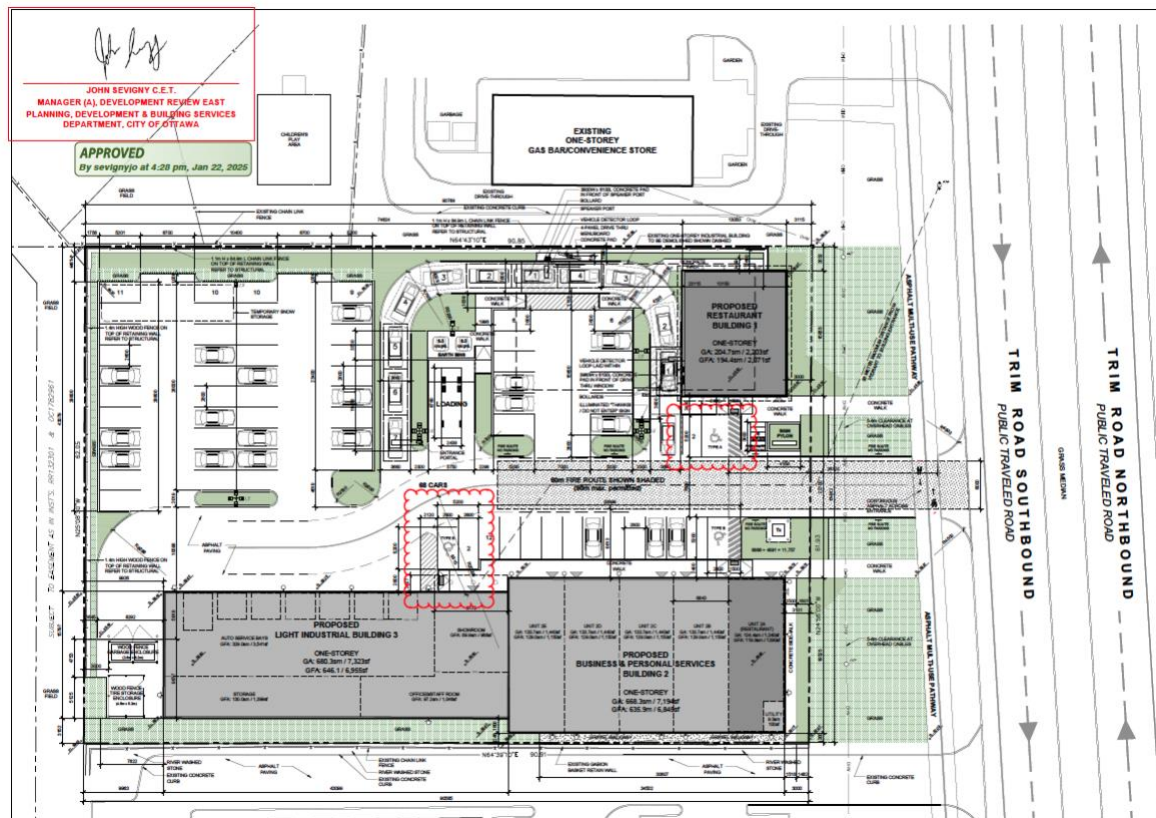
Extract of Site Plan (Source: McRobie Architects & Interior Designers)
